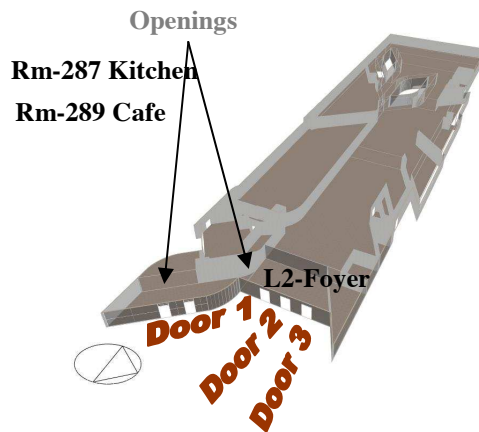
Rendered view of Level 2 floor plan showing the three doors and zones connected by air space.
